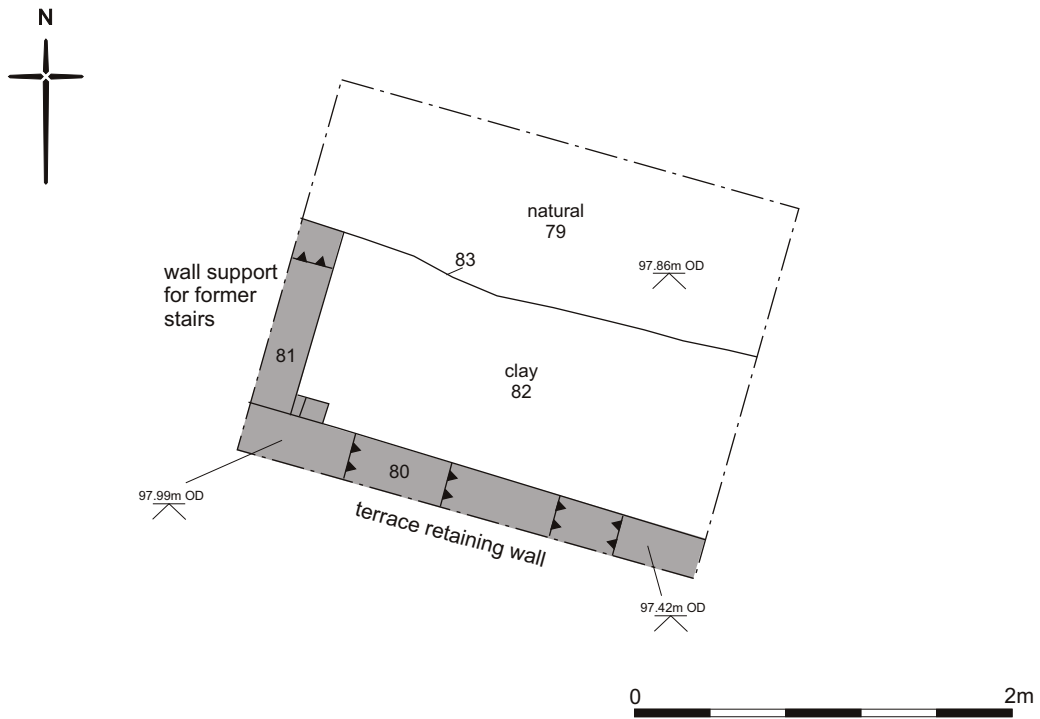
Test pit 4, plan of terrace retaining wall and supports for former stairs
